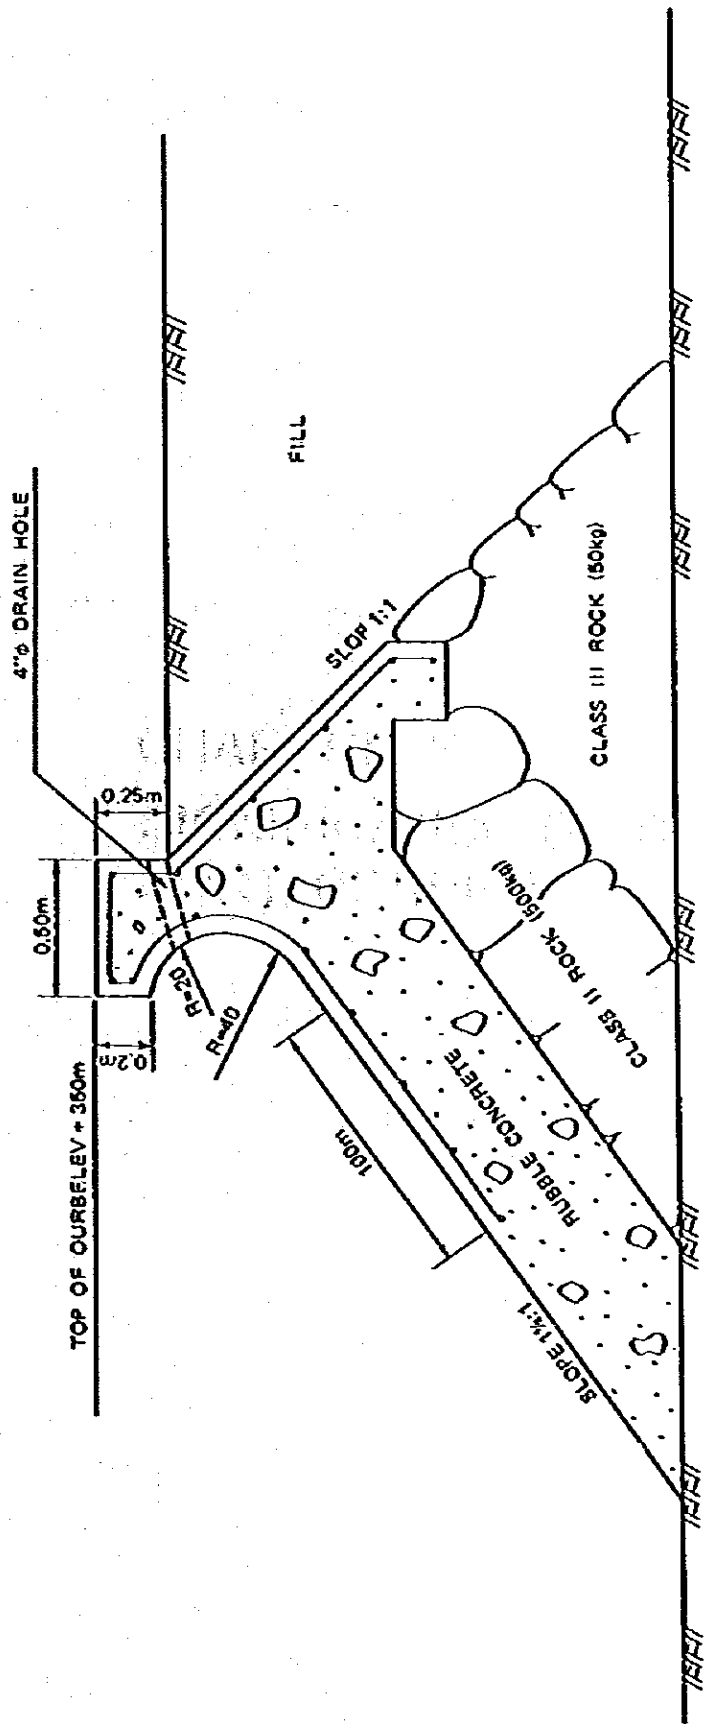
Typical Cross Section of Bulkhead at Port of Irene
